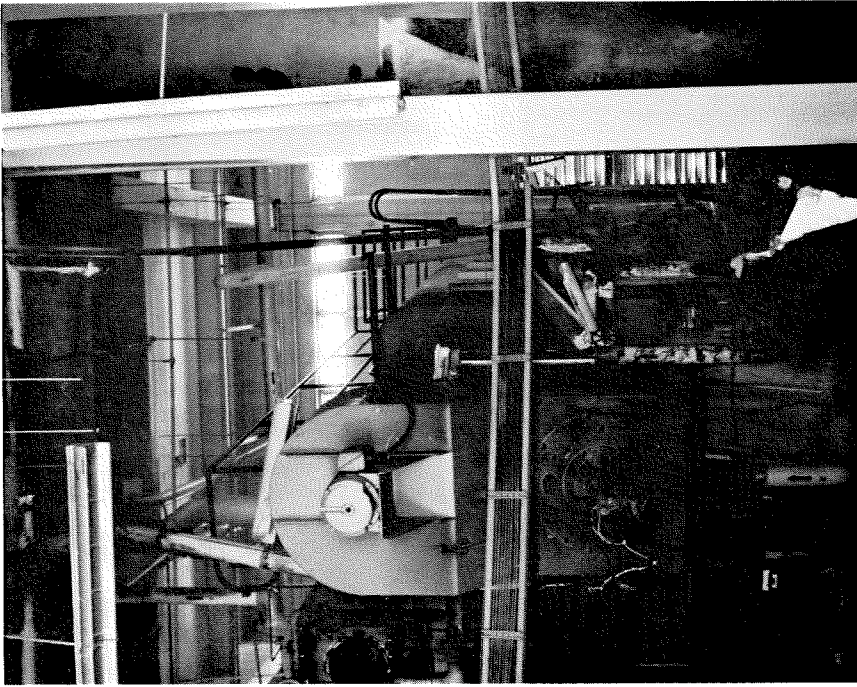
View, looking west, of one of the boilers in the new power building at Olive View Hospital. The western end of the boiler had not been anchored to the floor and it moved about four feet, relative to the floor, in a northerly direction. Equipment in this building that had been anchored to the floor did not break loose.
